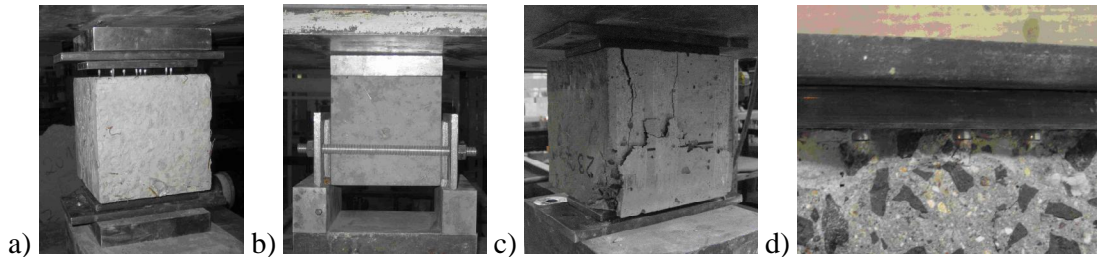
Course of the experiment - a) pressing of fixing plates, b) test of fixing resistance, c) failure of specimen due to transverse tensile in the phase of pressing, d) detail of impressing fixing pins
